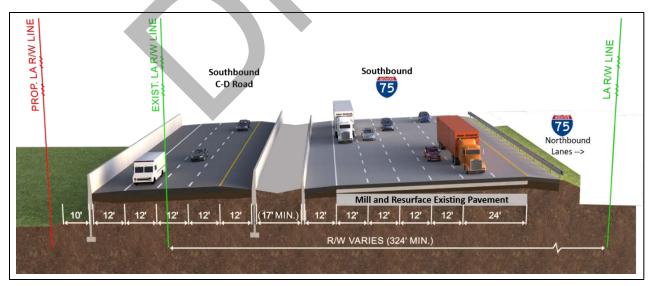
Graphically Enhanced Typical Section of Preferred Alternative
